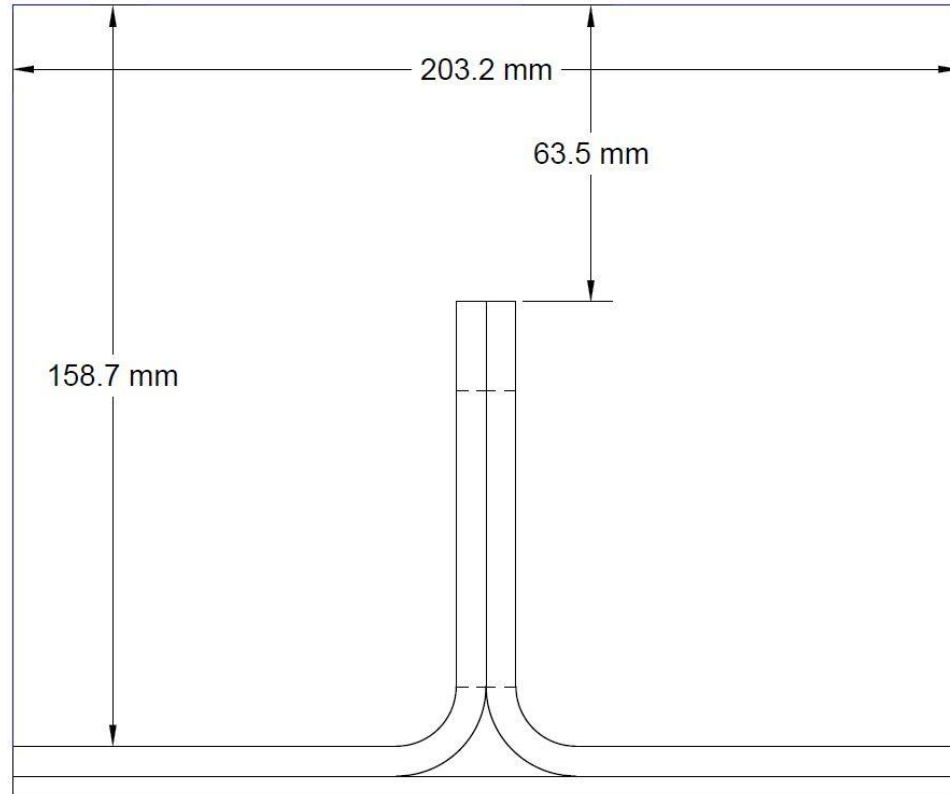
Design dimensions of concrete on the stiffened panel cross-section
